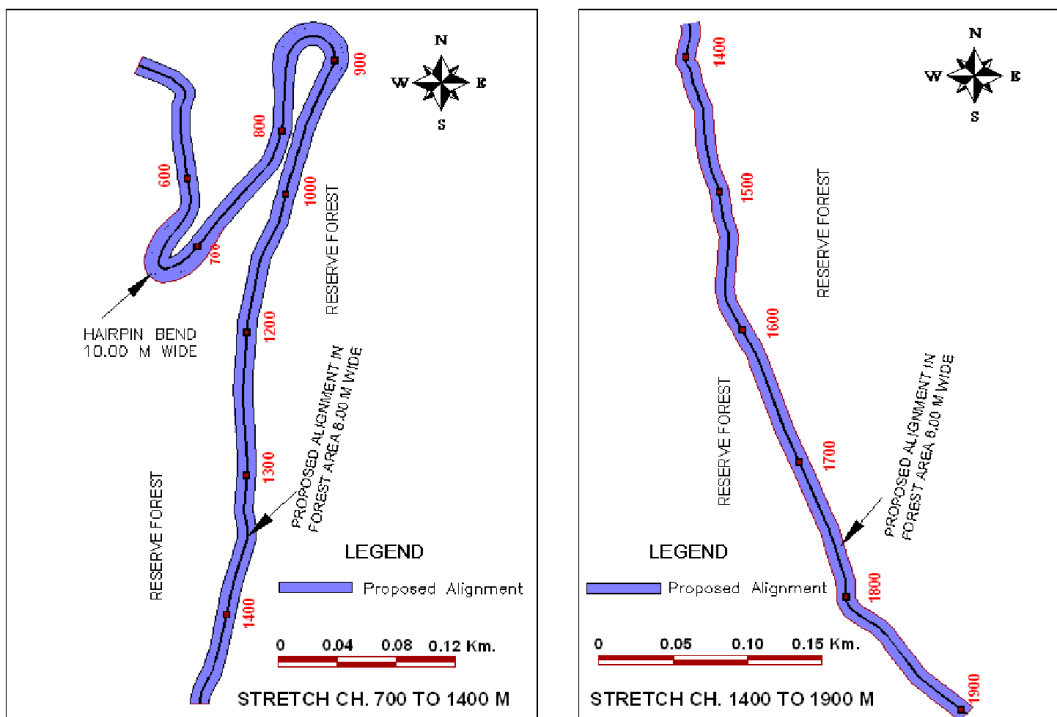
(b) - Alignment plan from 700 m to 1900 m
